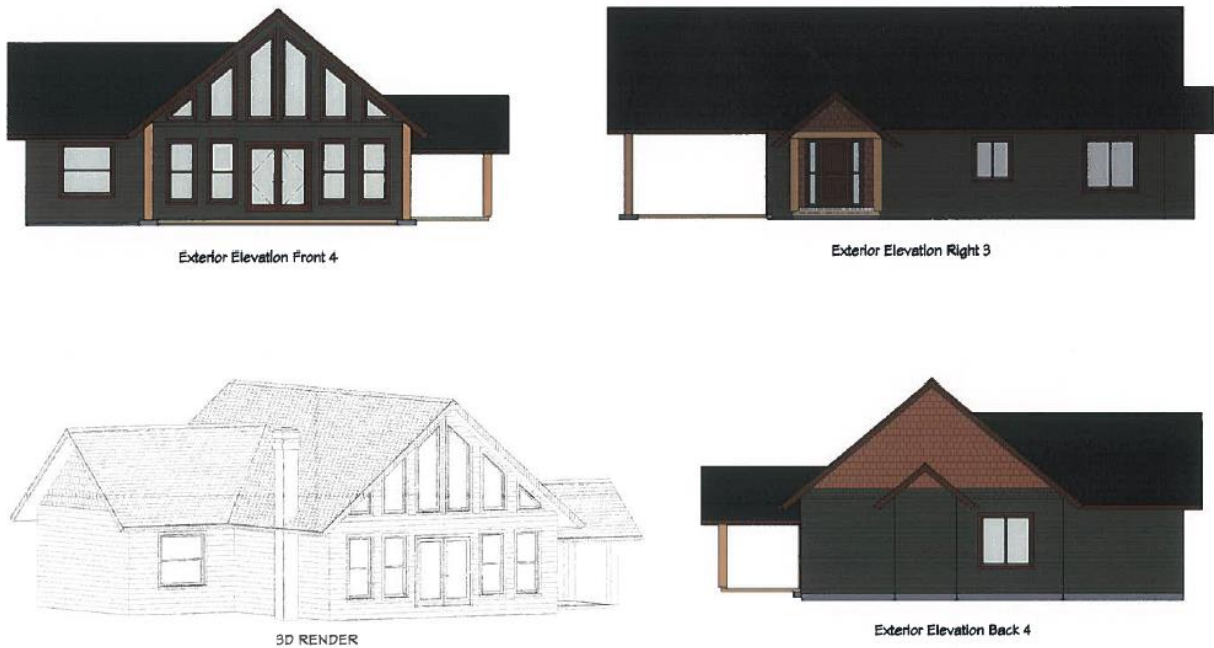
Elevation Drawings of Proposed Dwelling Unit
